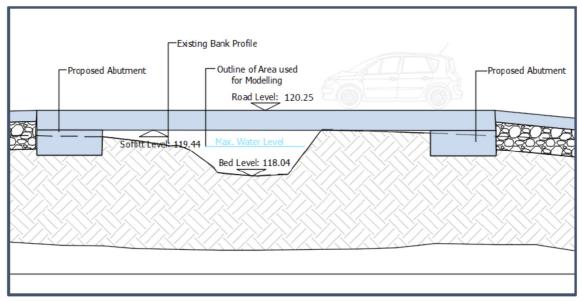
Extract from SSFRA fig.5.8 - Typical section at Stream Crossing
